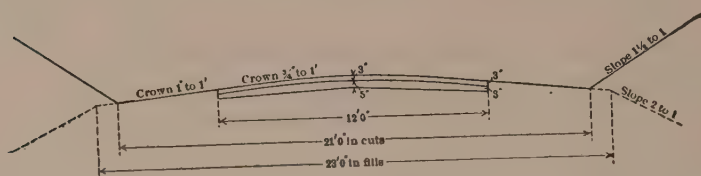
Cross-section Gravel Road. Maine State Highway Department.
